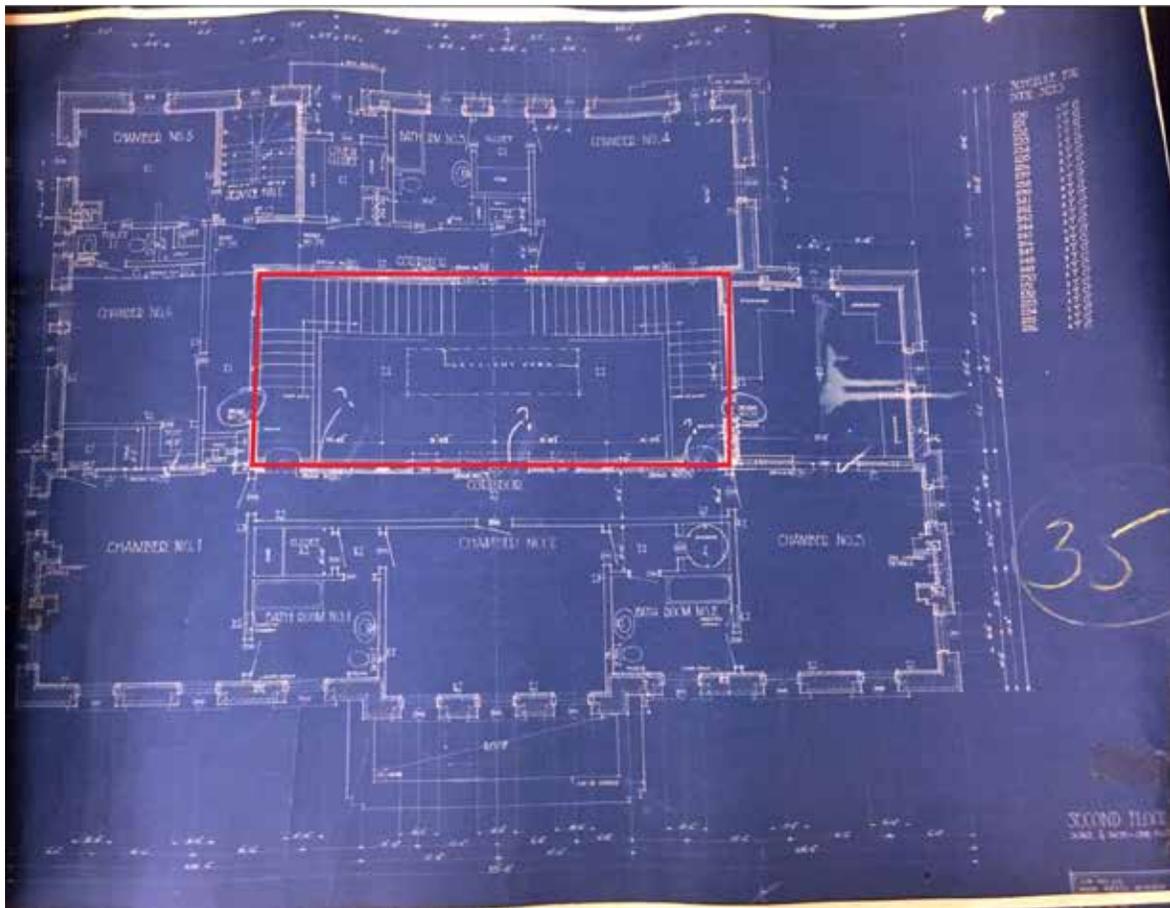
Second Floor Plan: Interior Designation includes the Great Hall. It includes decorative plaster and stonework. It does not include mechanical or electrical features.
